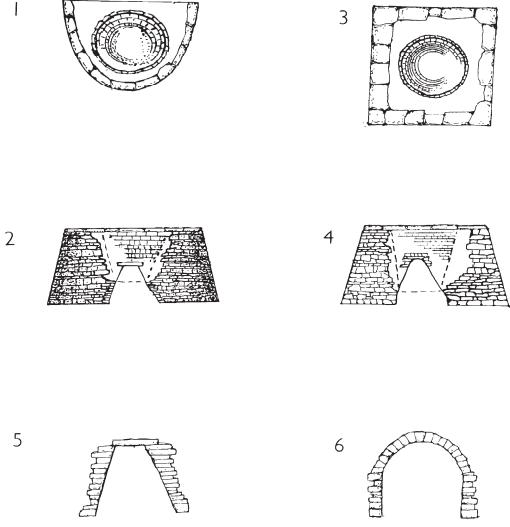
The typology of limekilns: 1-2) plan and section of three-quarter circular kiln. Most examples of this type abut onto solid stone walls, though they may (like Mwnt) abut onto an earthern bank; 34) plan and section of rectangular kiln type (eg Llanrhystud, Old Castle); 5) 'triangular' drawing arch (eg Aberbach, Aberfforest, Porthgain); 6) rounded type (eg Cwmtudu, Llangrannog, Williamston Pill). Not to scale but limekilns stand up to c 6 m high and c 6 x 4 m in section. (Illus. C Stephen Briggs)
